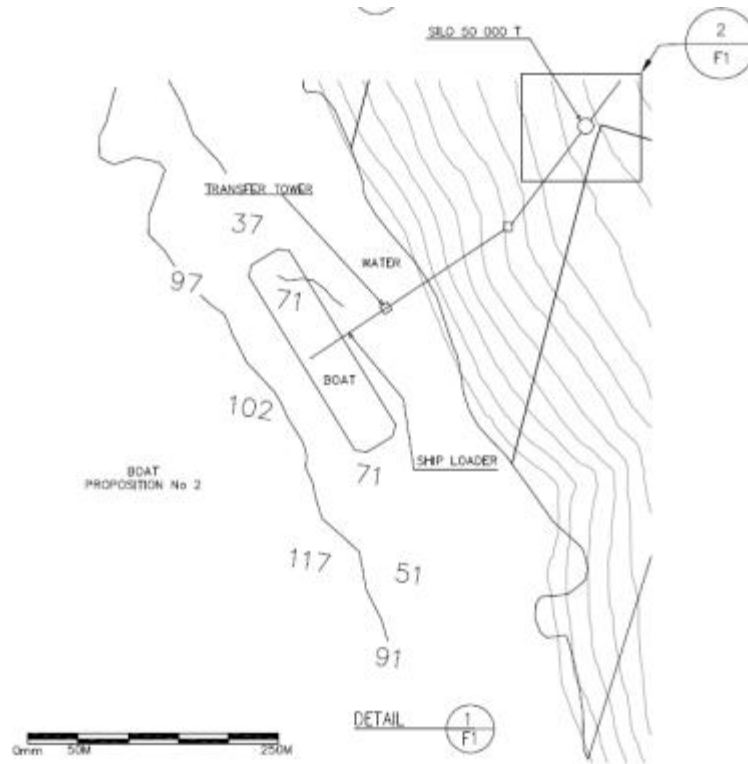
Elevation View of the Saint-Fulgence Site (see Appendix 15 for more details)
